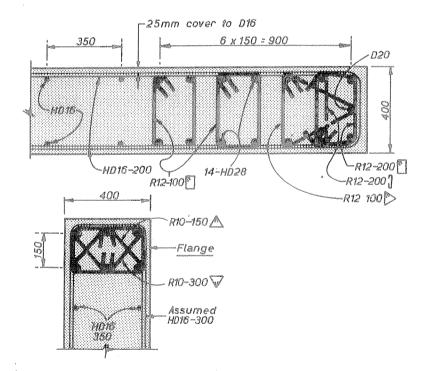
Arrangement of Transverse Reinforcment in the Critical Regions of the Example Shear Wall Section.
